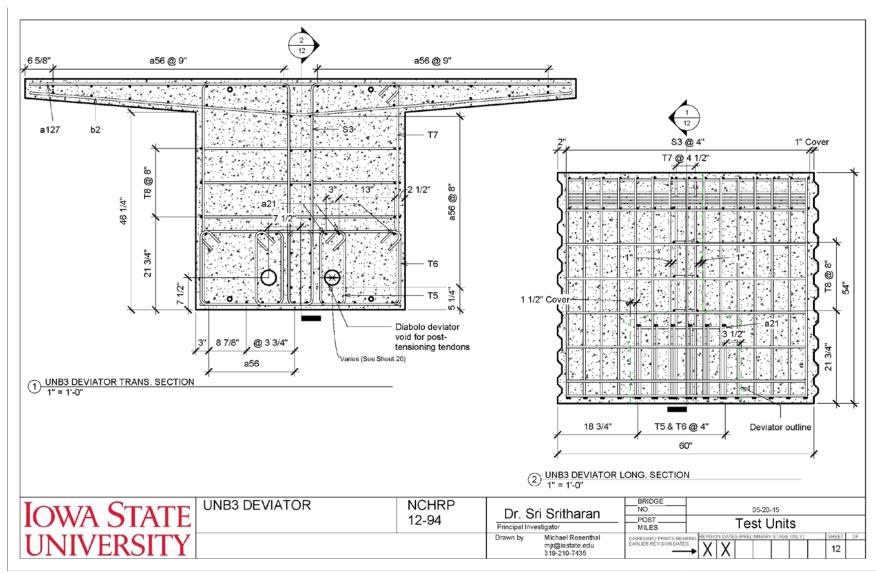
UNB3 Deviator Segment Longitudinal and Transverse Section
